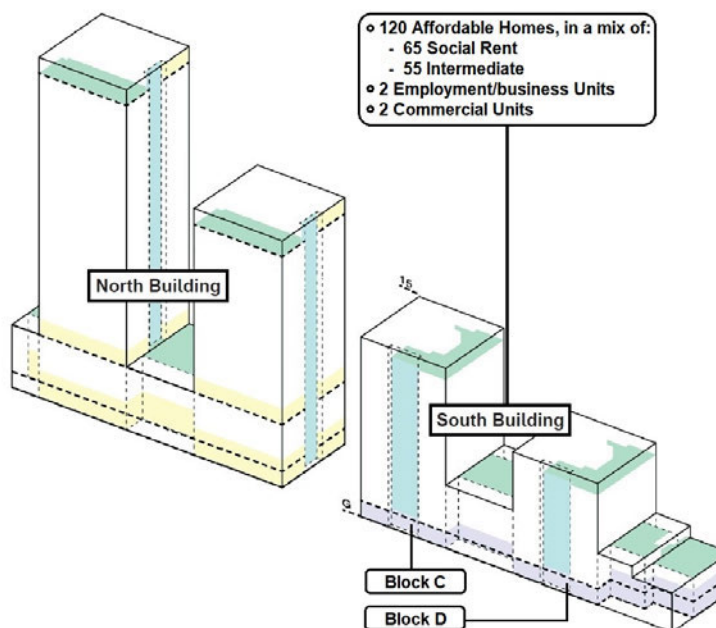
(above): Diagram of the proposed development, highlighting the South Building and providing key details about the uses it would contain. Image 14 (above): View of the South Building from Zampa Road.
